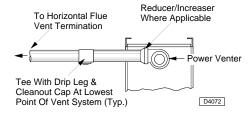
Horizontal Right Vent Position (Rear View of Unit Heater)
